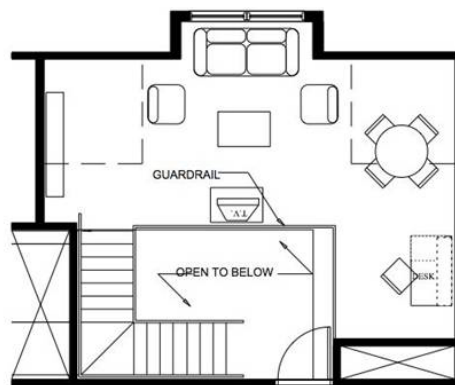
Loft unit, upper level floor plan, Maple Hill housing
